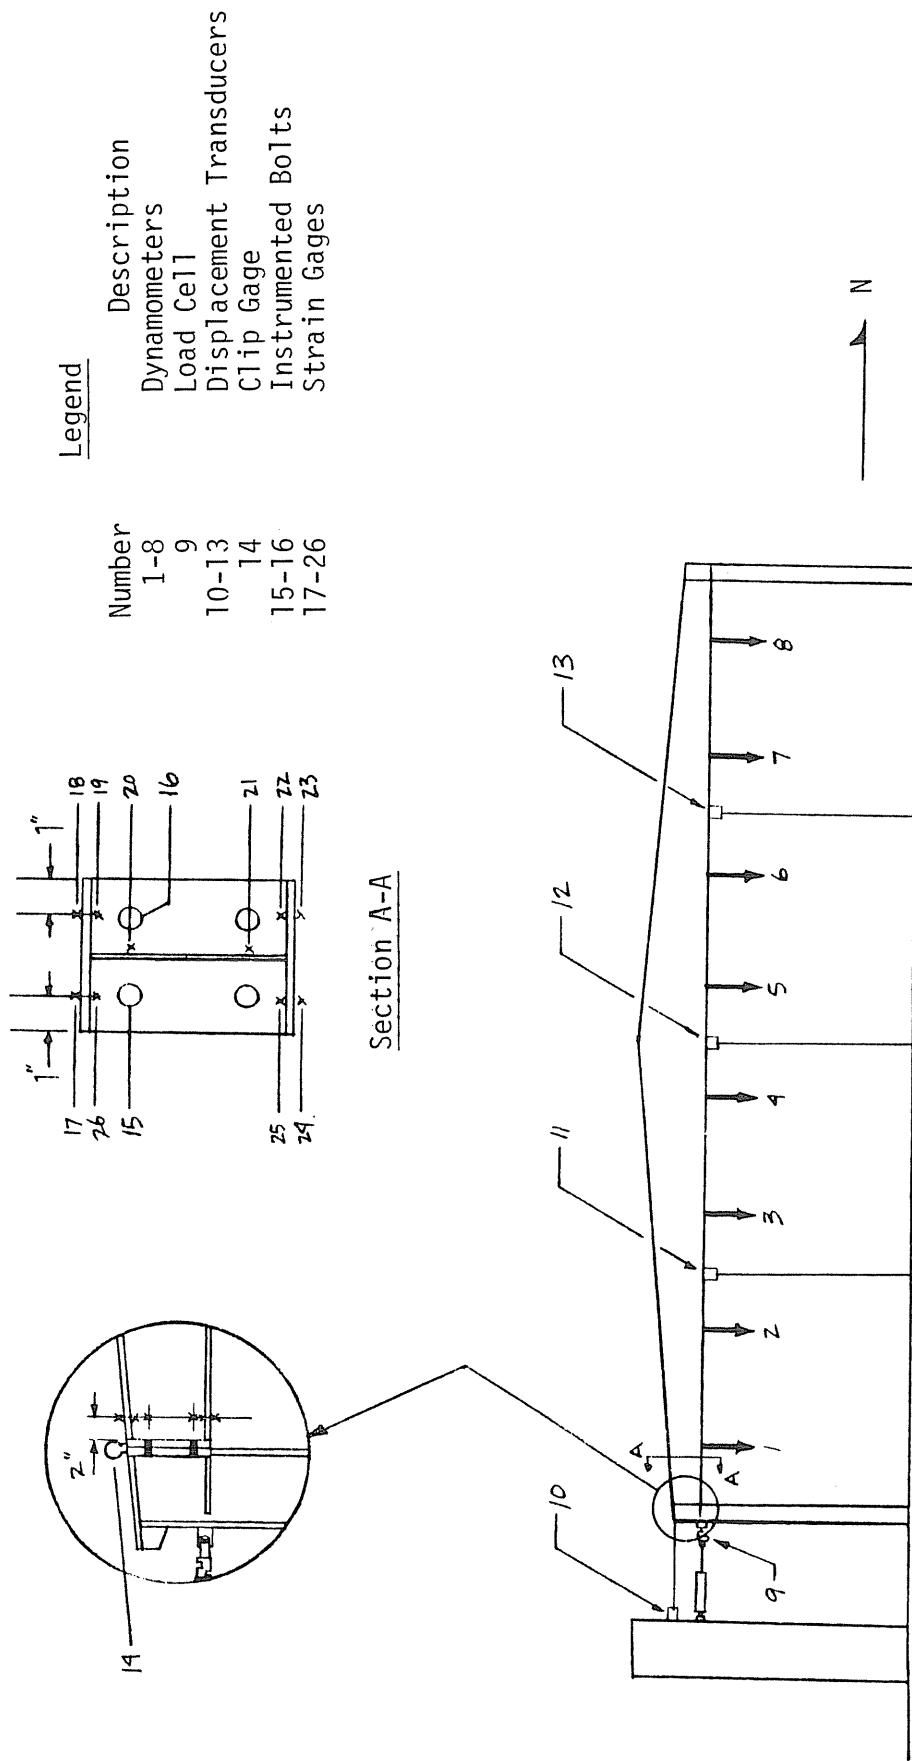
VIEW OF WEST FRAME INSTRUMENTATION
